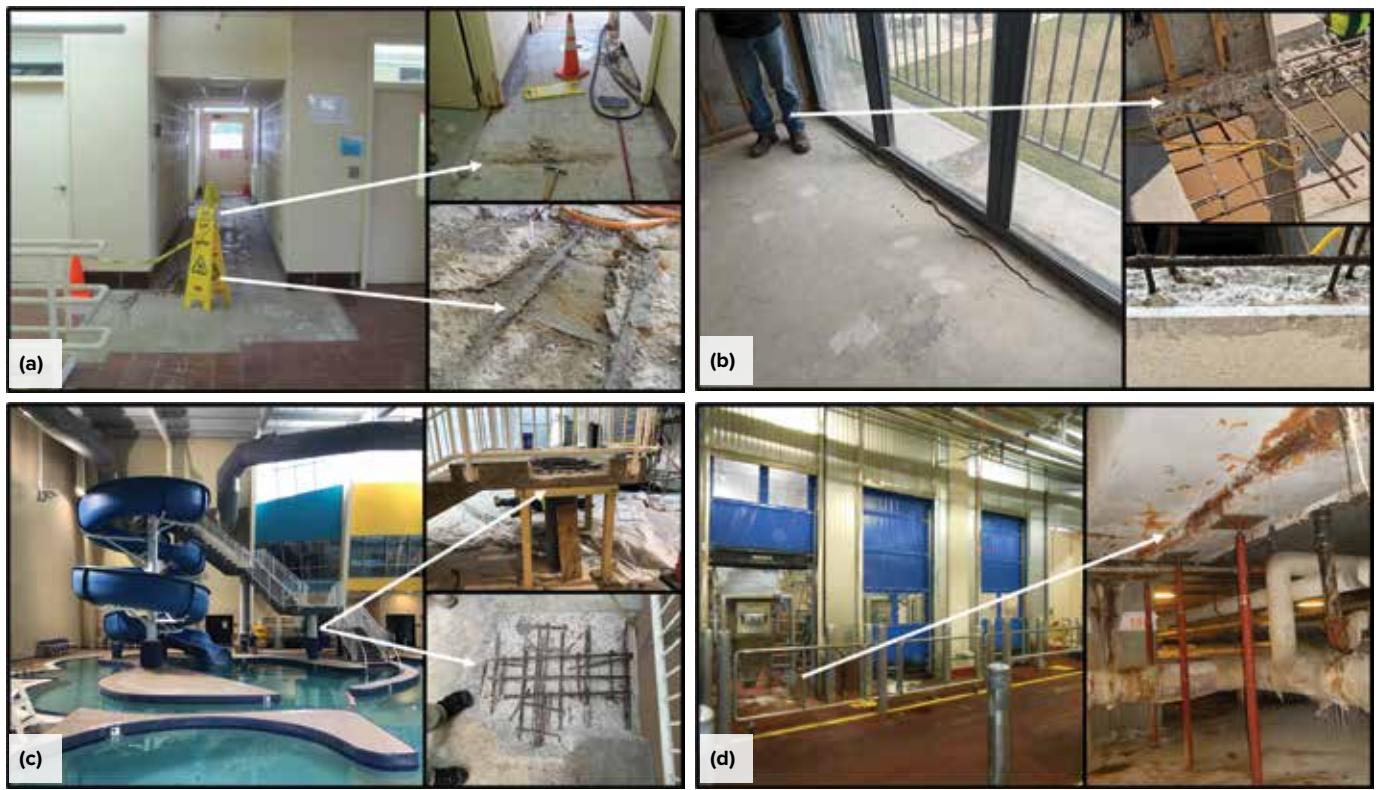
Corrosion in interior concrete due to penetration of contaminants such as chlorides or other halides: (a) water treatment facility hallway near hypochlorite room; (b) interior of coastal condominium unit adjacent to exterior balcony at sliding glass door (photos courtesy of Kent Yarborough and Mason Undercoffer); (c) indoor water park reinforced concrete stairs (photo at lower right courtesy of Eric Couch); and (d) food manufacturing facility spicing area (arrow shows particularly damaged area near expansion joint)
